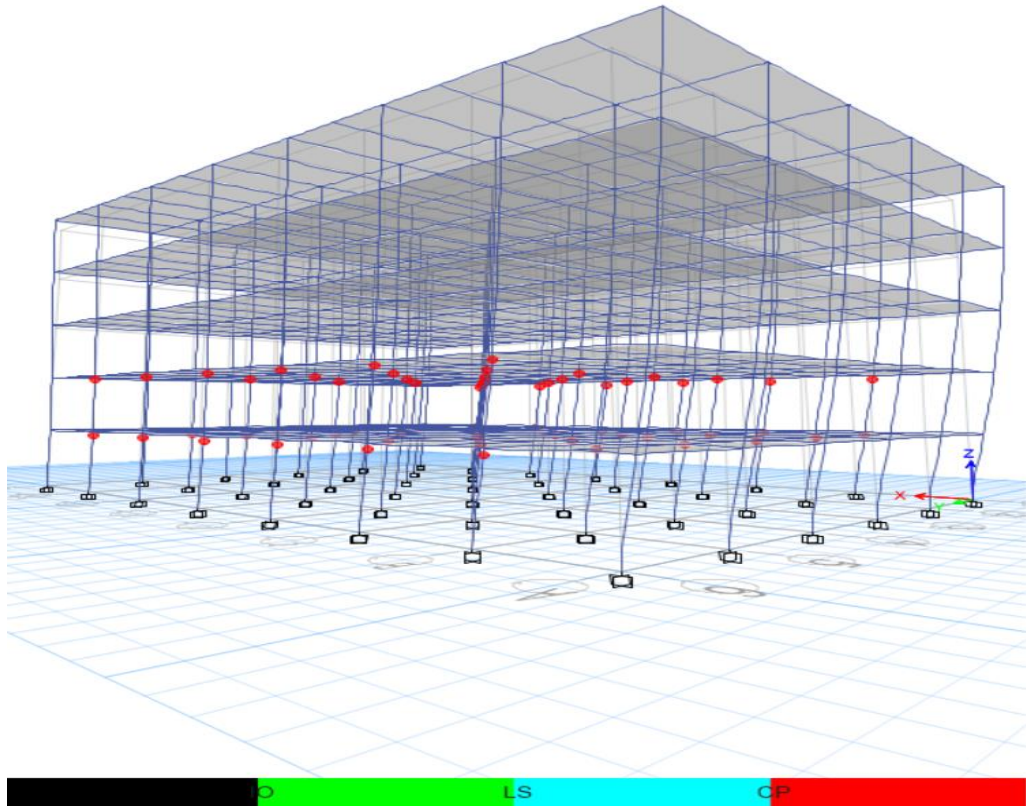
Collapse stage of plastic hinges of MRF 5-story steel building
